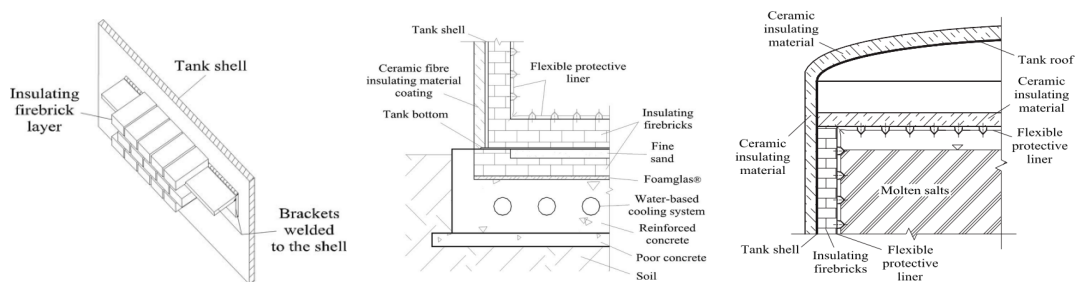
Molten storage. Left Insulating firebrick layer, middle storage-tank foundation and right storage tank roof construction (Gabbrielli & Zamparelli, 2009)
